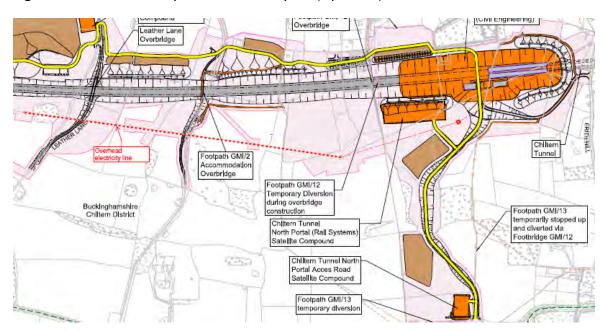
Location plan of the Proposed Scheme Layout (Option A)
